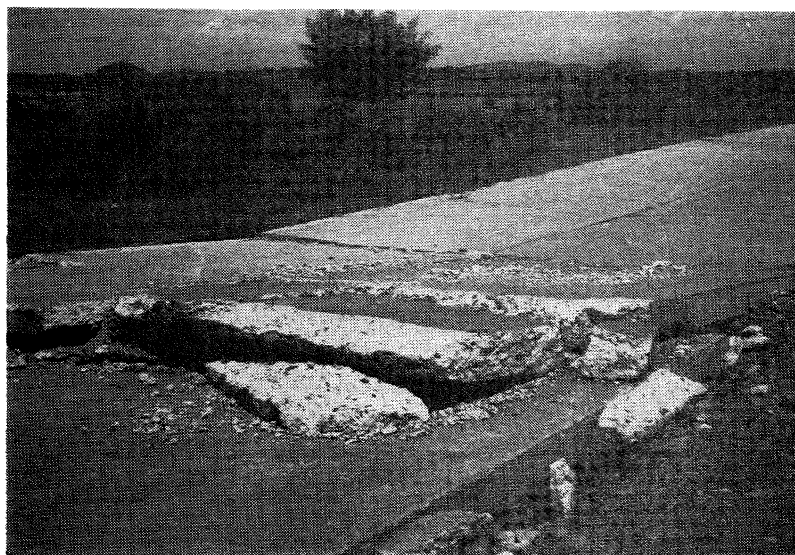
Damage to road pavement due to offset of Phillipines fault trace 3.5 km west of Rizal
